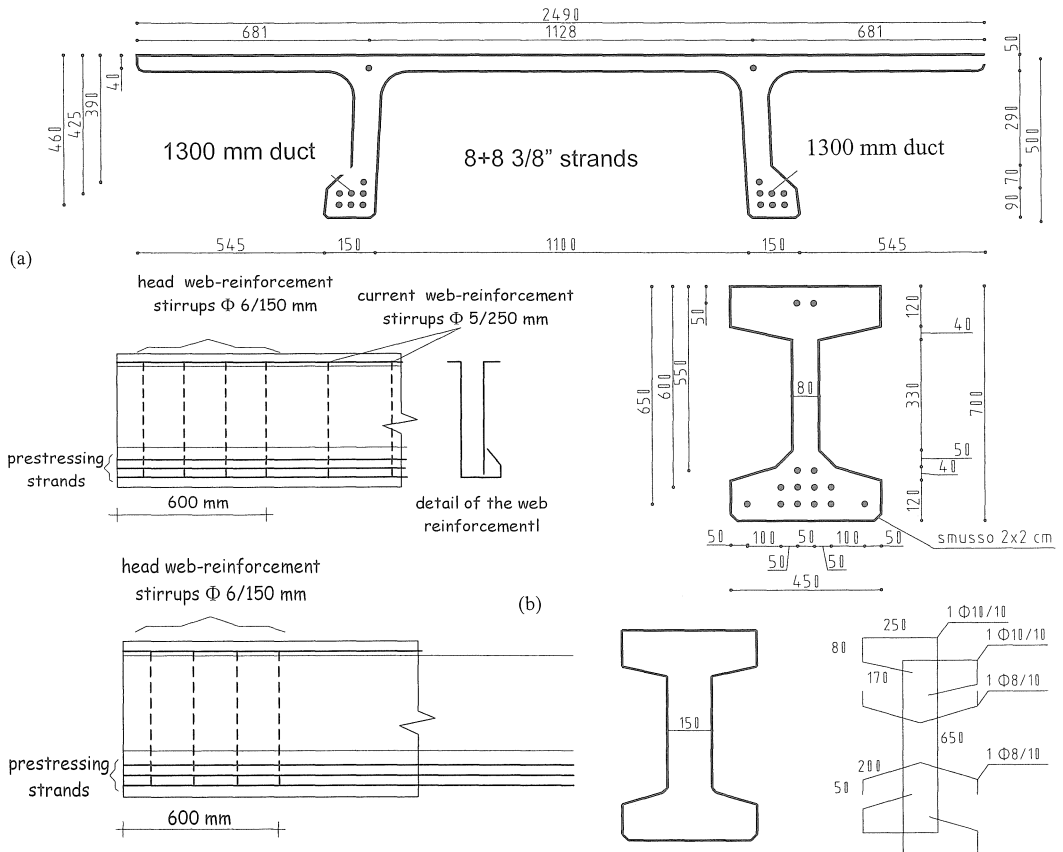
Geometry and reinforcement details of the tested prototypes: (a) TT element cross section, (b) TT element head reinforcement details, (c) I beams cross section and head reinforcement details.
